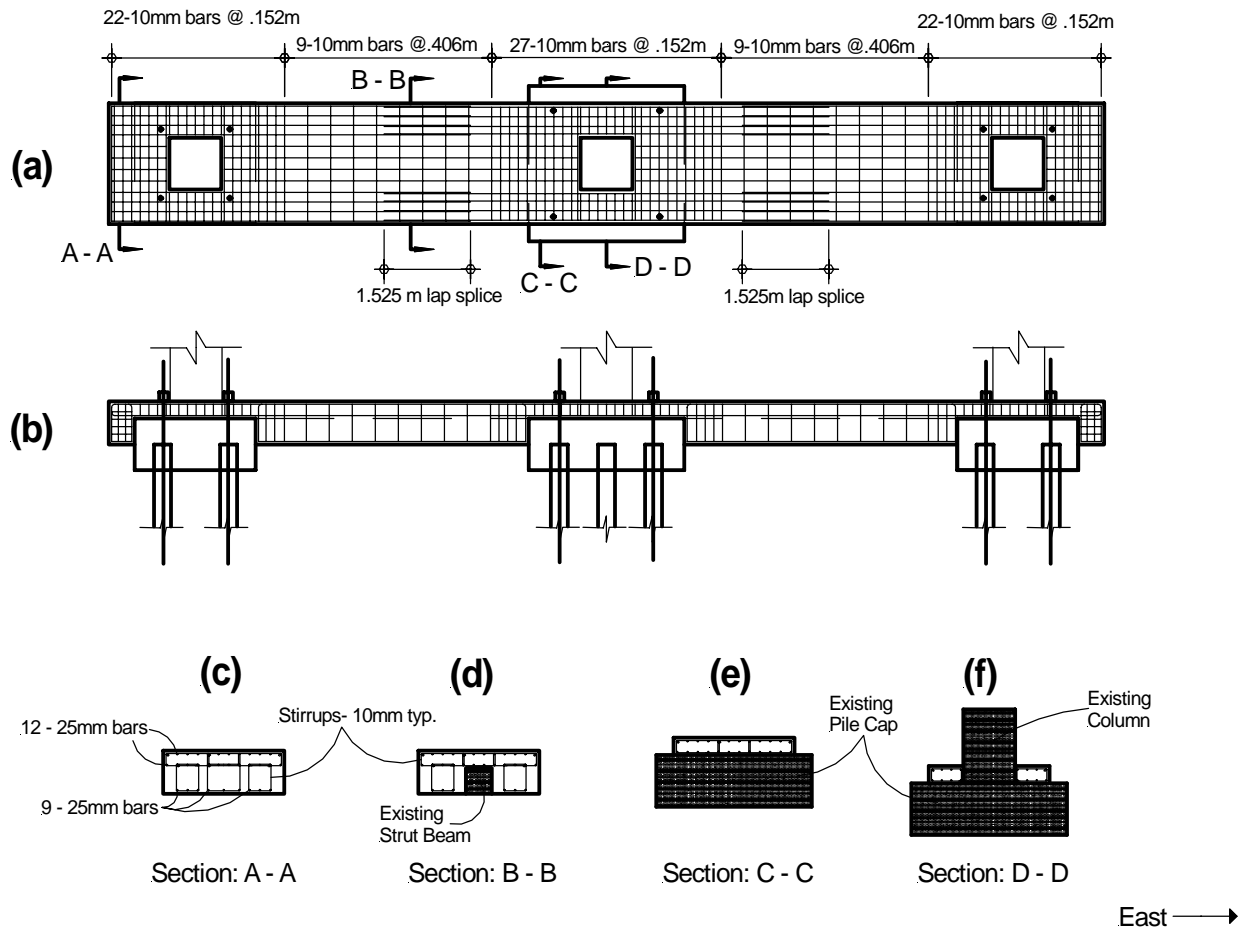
Modified grade beam for Bent #4S: (a) plan, (b) elevation, (c) knee joint cross section, (d) mid-span, (e) overlay of existing pile cap, (f) overlay of existing pile cap around column
